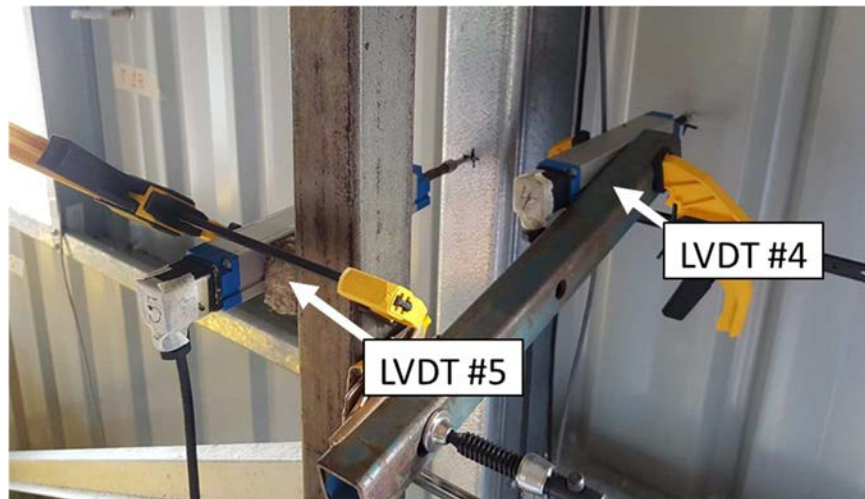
LVDT #4 and #5 mounted on the central Northern wall column and cladding beside the Northern wall column
